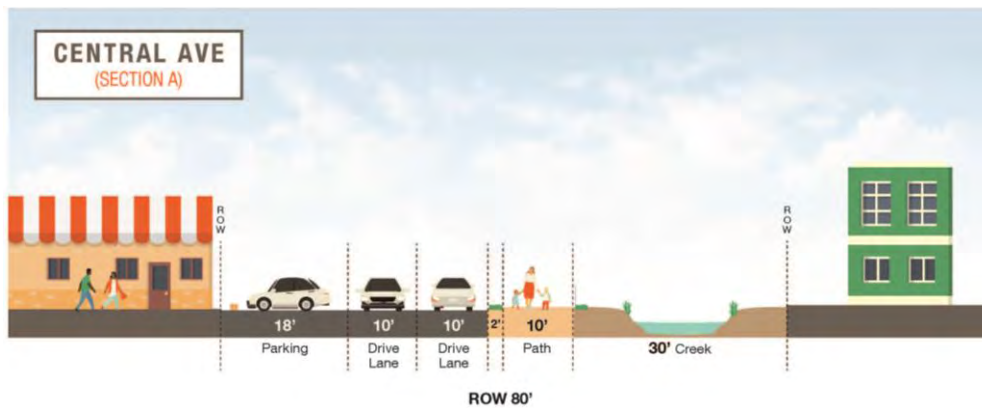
Proposed Typical Section of Central Avenue (Section A)
